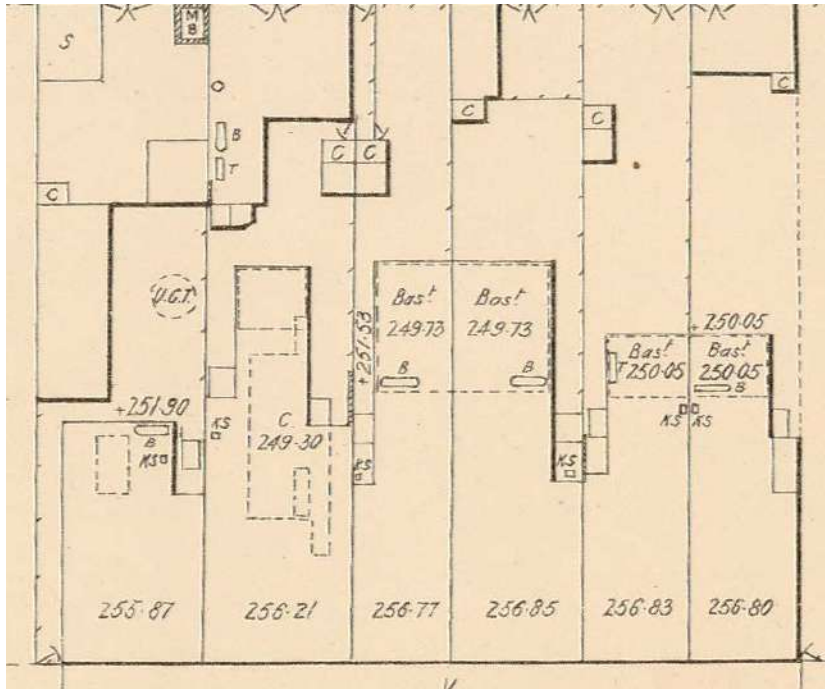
MMBW Detail Plan no. 2119, showing the row of shops at 351-361 Canterbury Road in 1909 (Source: SLV).
